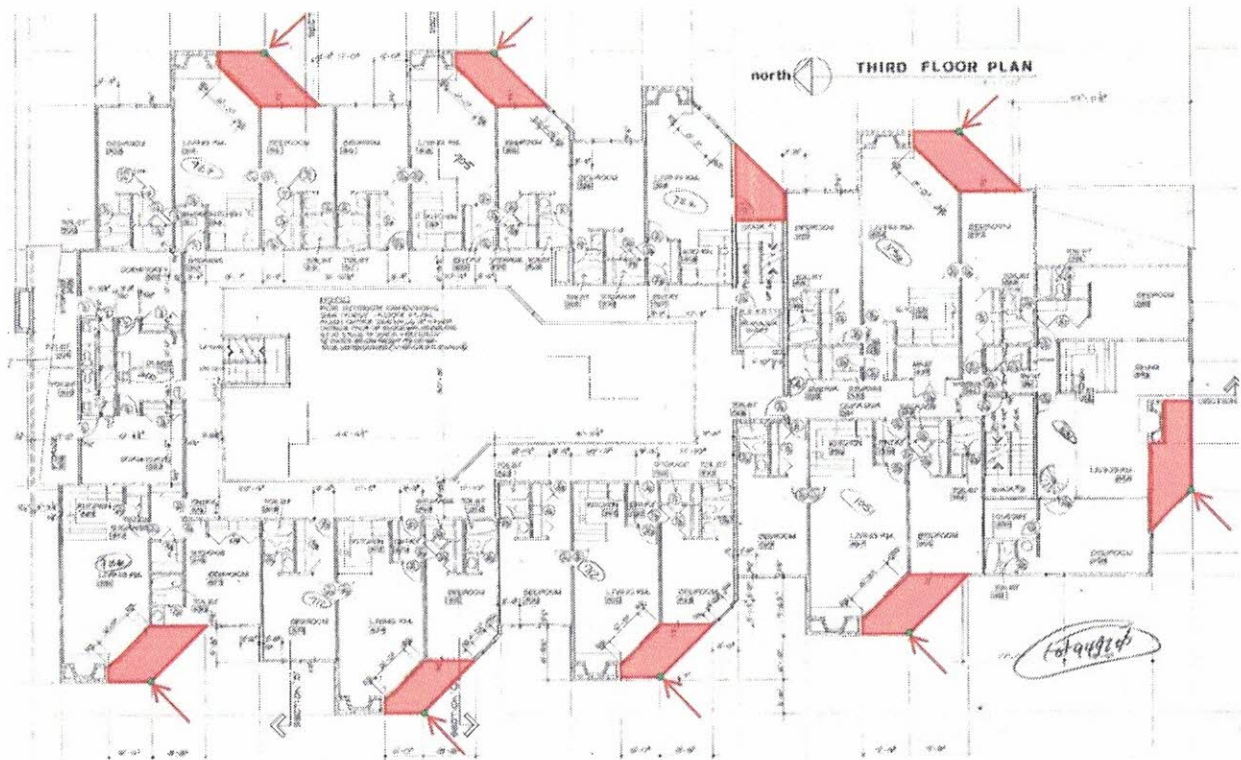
Third Floor Plan (Architectural Drawings). Note added columns indicated with arrows.
